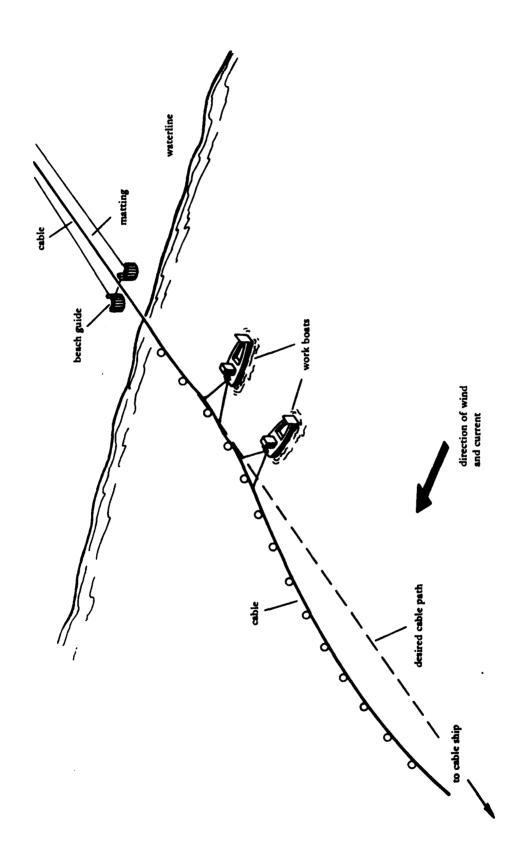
Removal of wind and current induced deflection of cable before positioning on seafloor.
